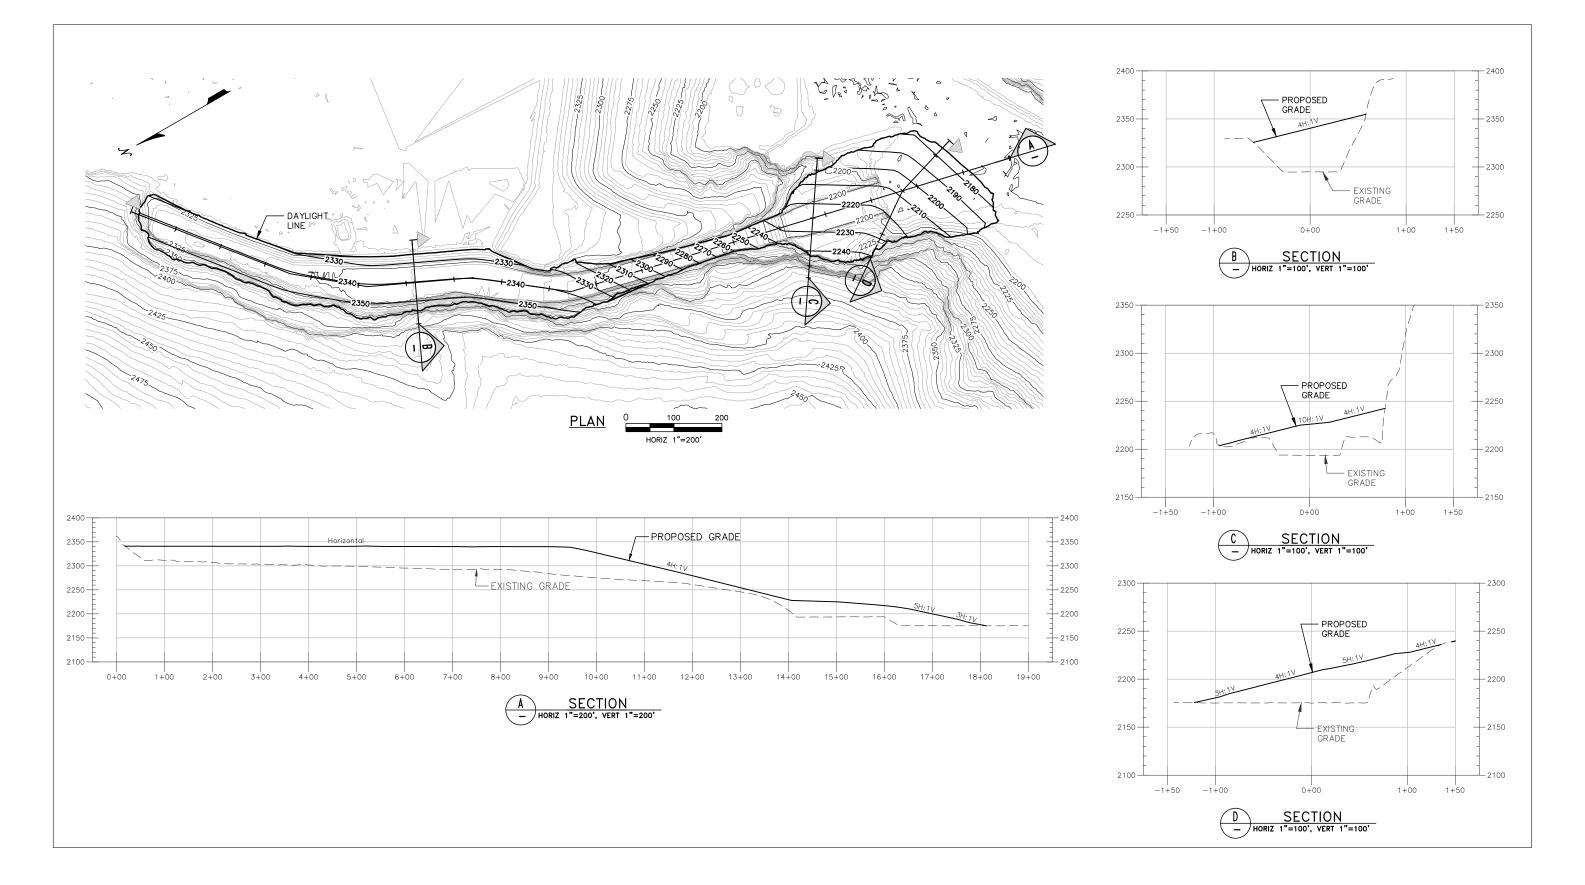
Iron Gate Spillway Backfill Plan & Sections
